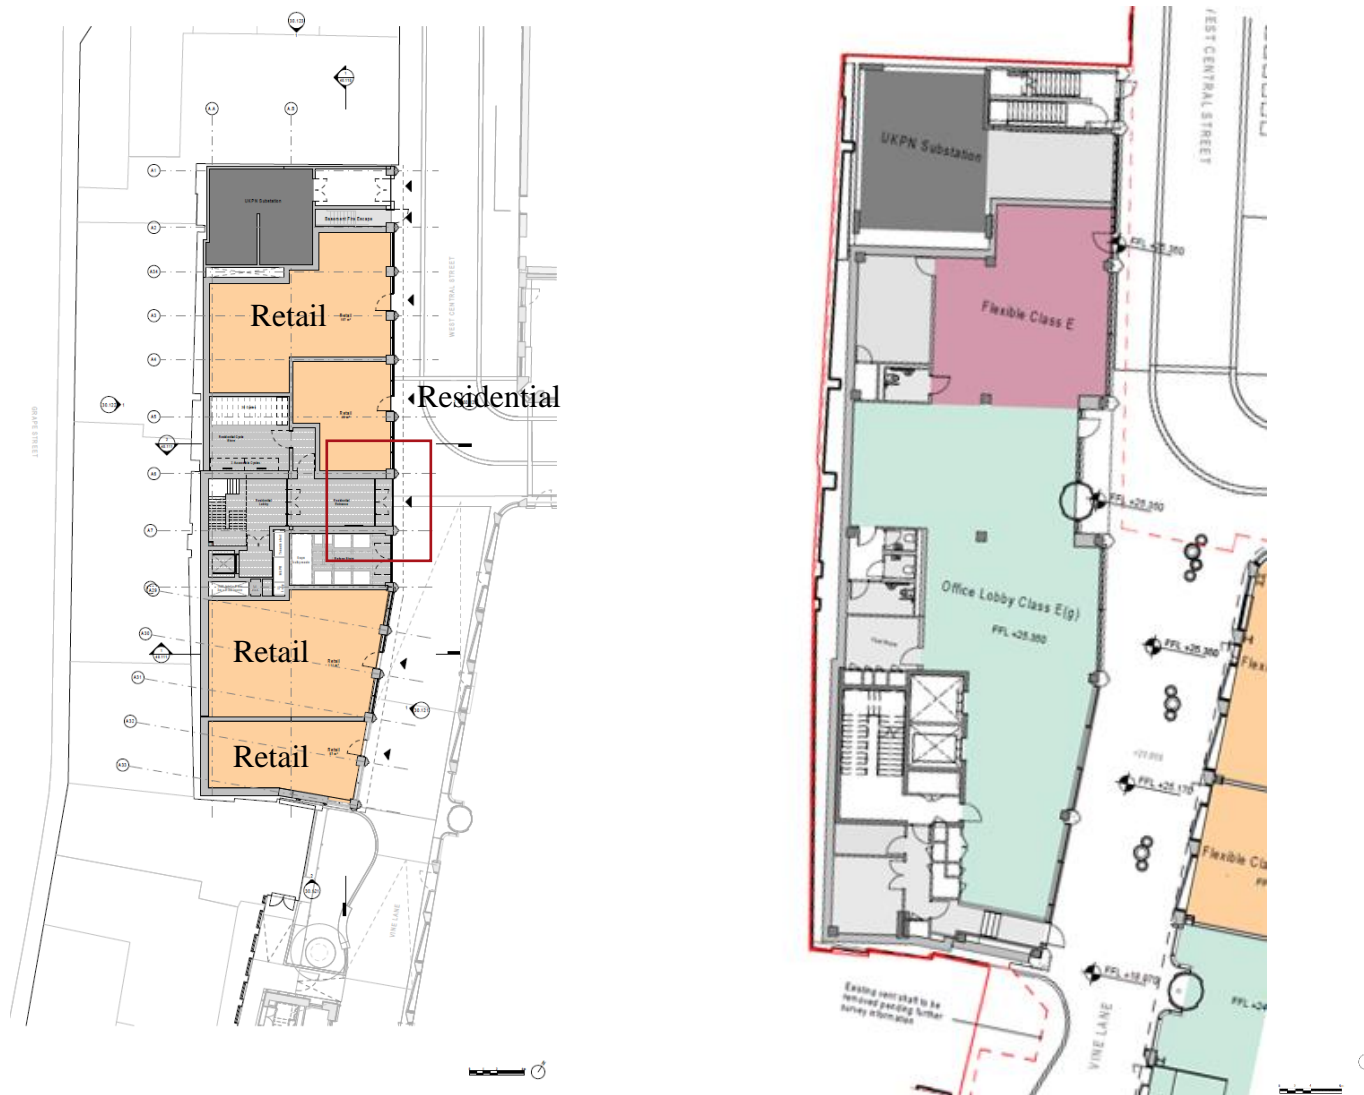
Current (e.g. February 2022) ground floor plan of Vine Lane building (left); previous (e.g. February 2021) ground floor plan of One Museum Street
